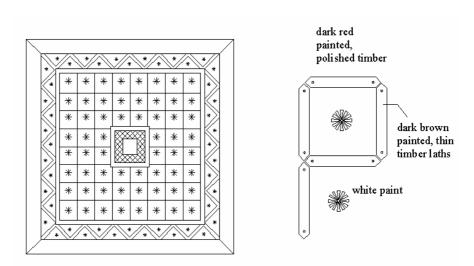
, Case 2, Schematic drawing of a timber ceiling of hayat (Taşdöğen)
